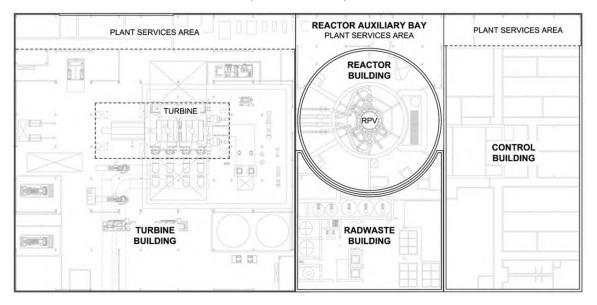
DNNP BWRX-300 Facility Layout (Source: GE Hitachi)
